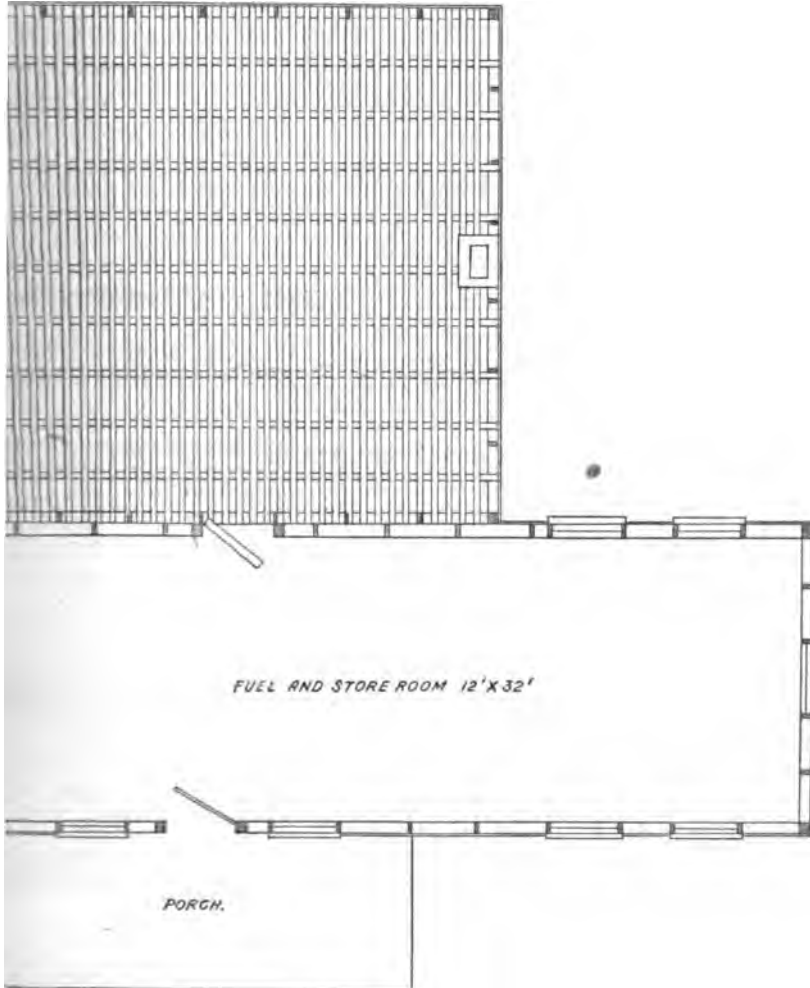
Second or dry-room floor of a hop-kiln evaporator.
